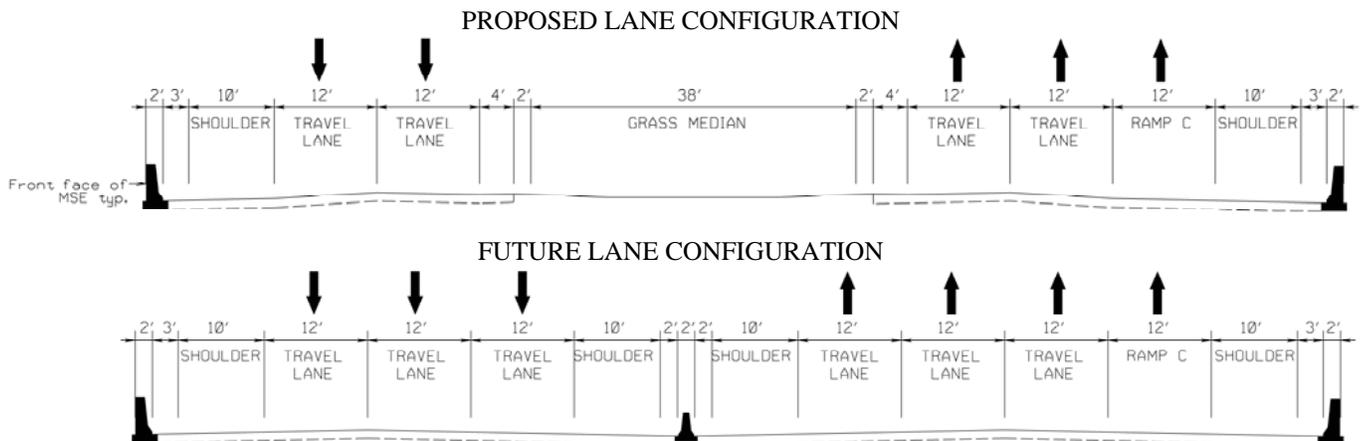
Typical Sections Proposed and Future Widening at the Bridge
